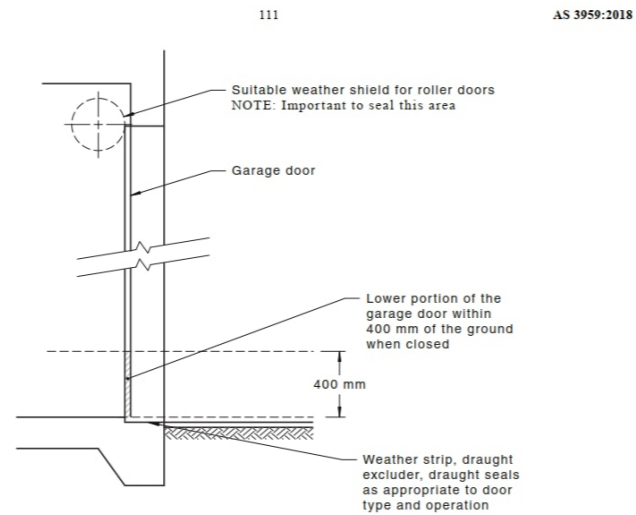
VEHICLE ACCESS DOORS (GARAGE DOORS)
